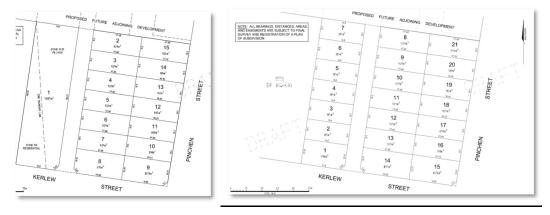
Approved (left) and future indicative subdivision plan (right) post rezoning to RU5 Village
